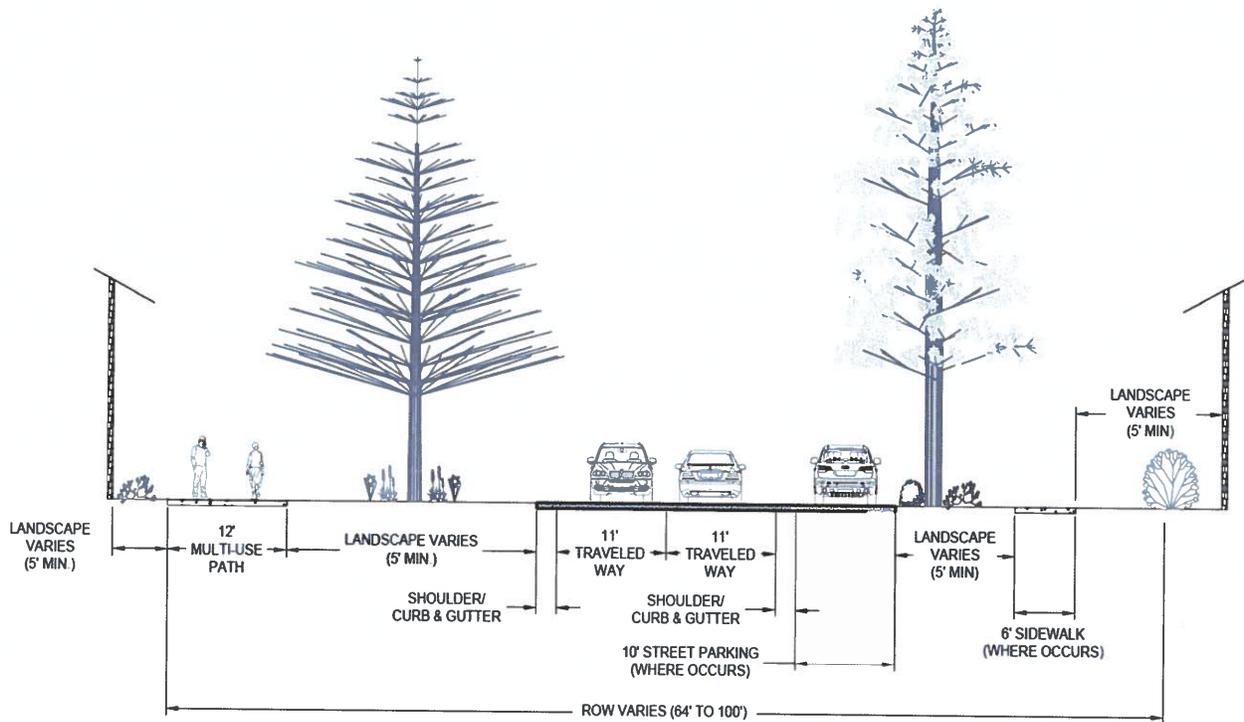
Typical Road Section (Chaparral Road, Tavern Road & Center Street)
